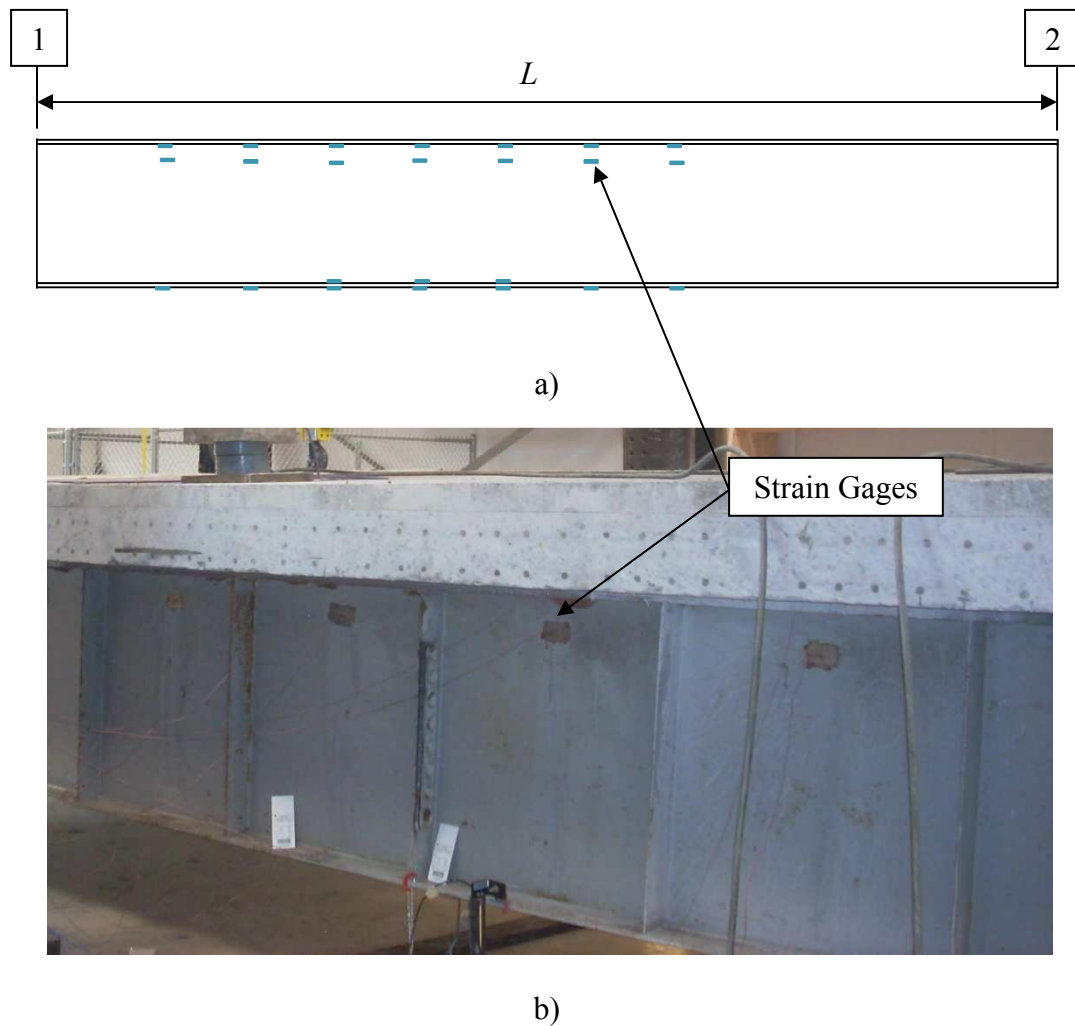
Loaded girder strain gage configuration a) for Specimen 2 and b) sample strain gages mounted to girder.
